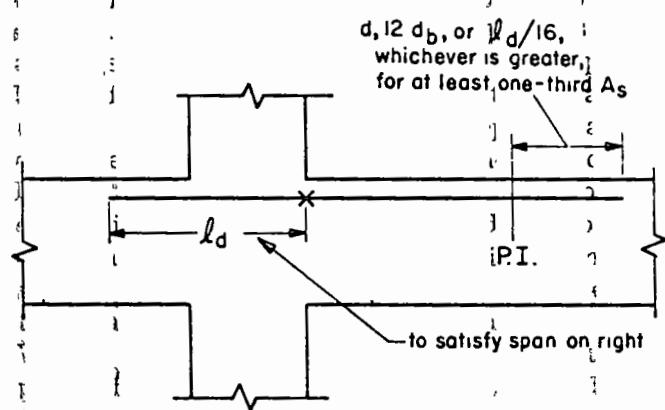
Anchorage into adjacent beam. Note: Usually such anchorage becomes part of adjacent beam reinforcement
